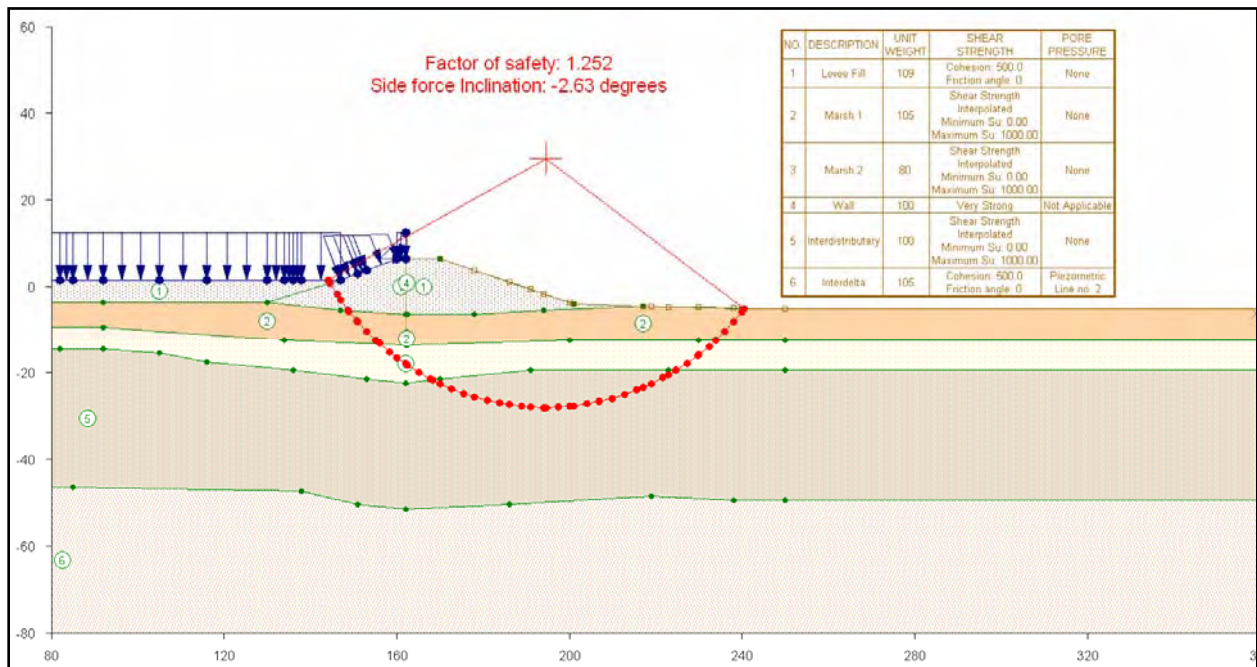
IHNC – East Bank (South Breach), Case 5, Canal Water Level = Top of Wall - 12.5 ft (NAVD 88), without Crack
